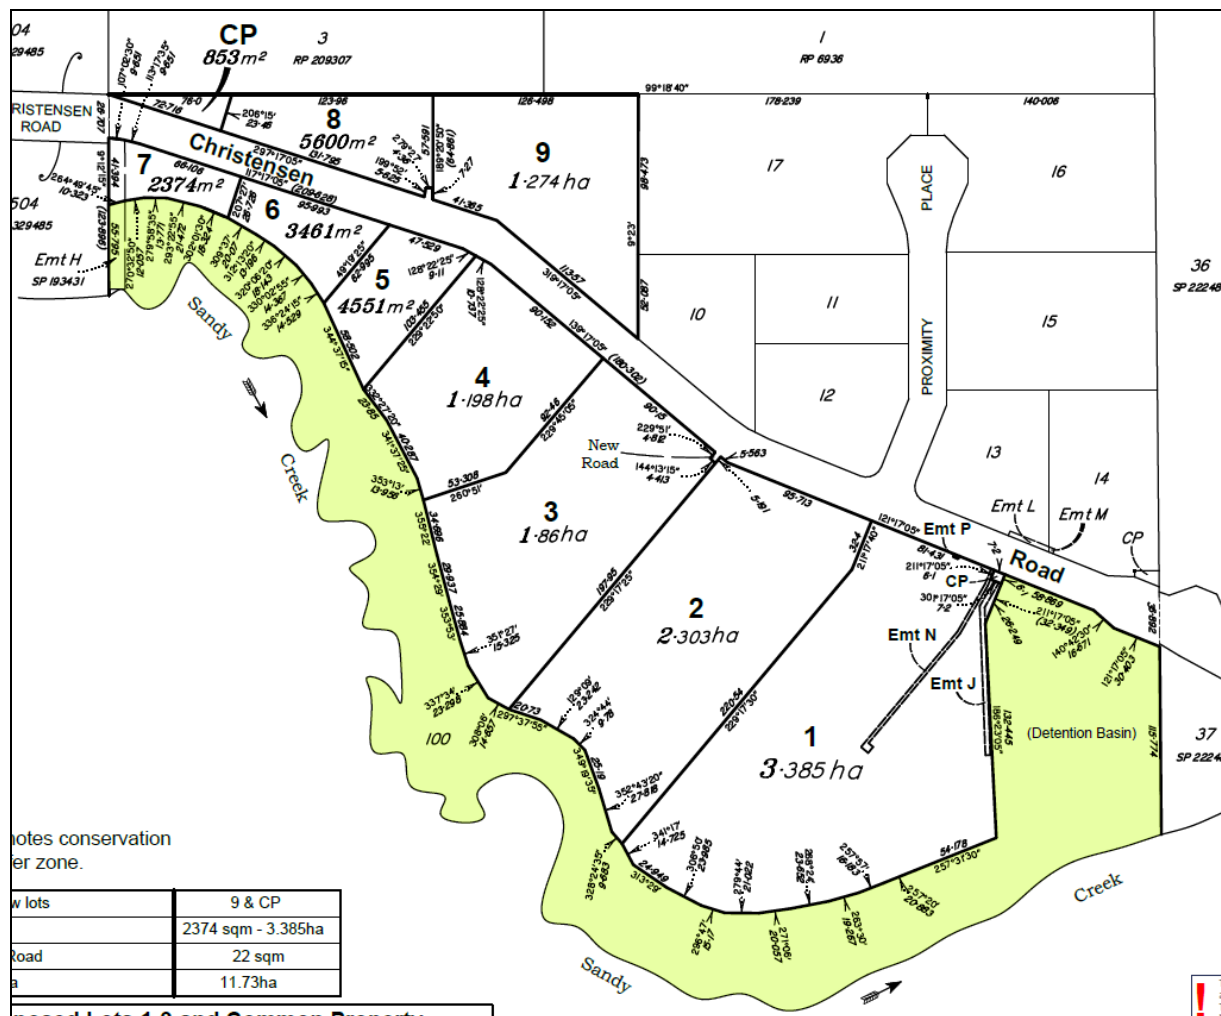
Plan of proposed Stage 3 (Source: AJS Surveys)
